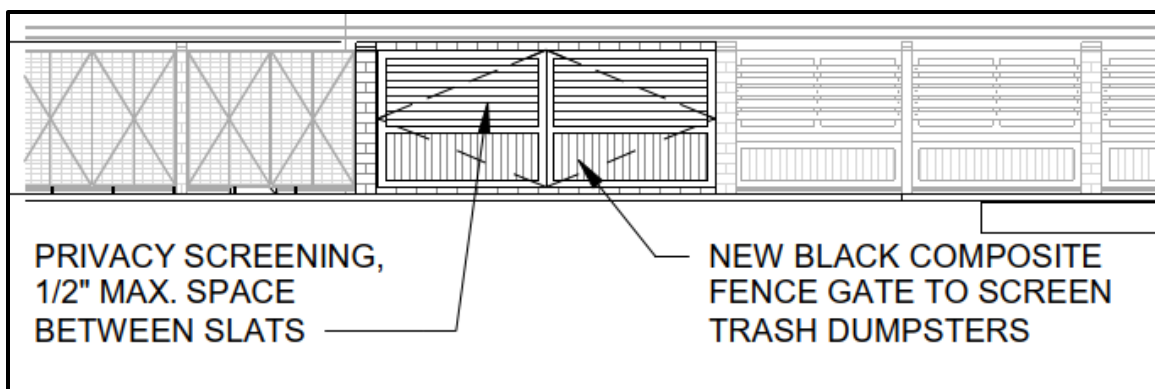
Trash Enclosure Elevation (full image can be found in applicant’s packet)
